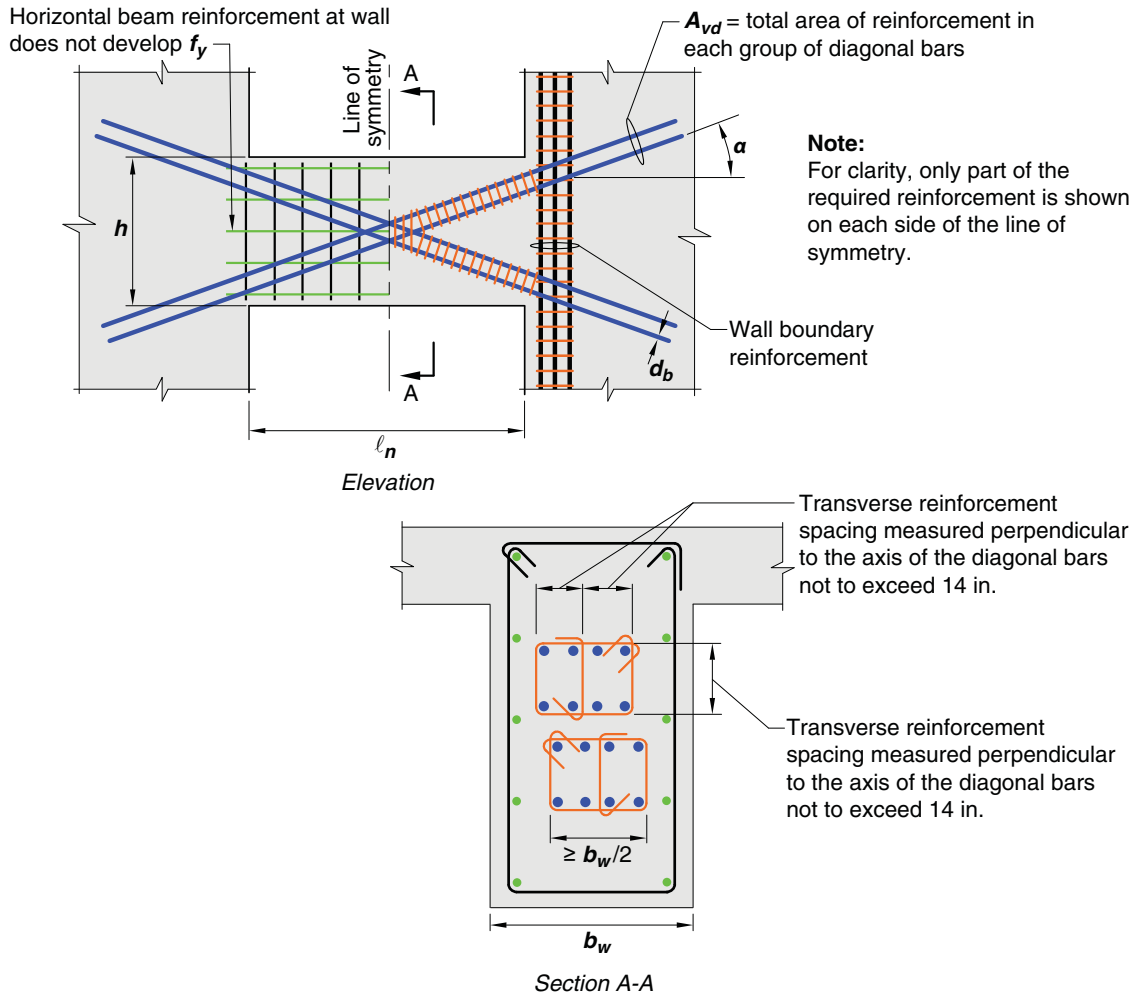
Diagonal reinforcement of reinforced concrete coupling beams (source: ACI 318-19).
